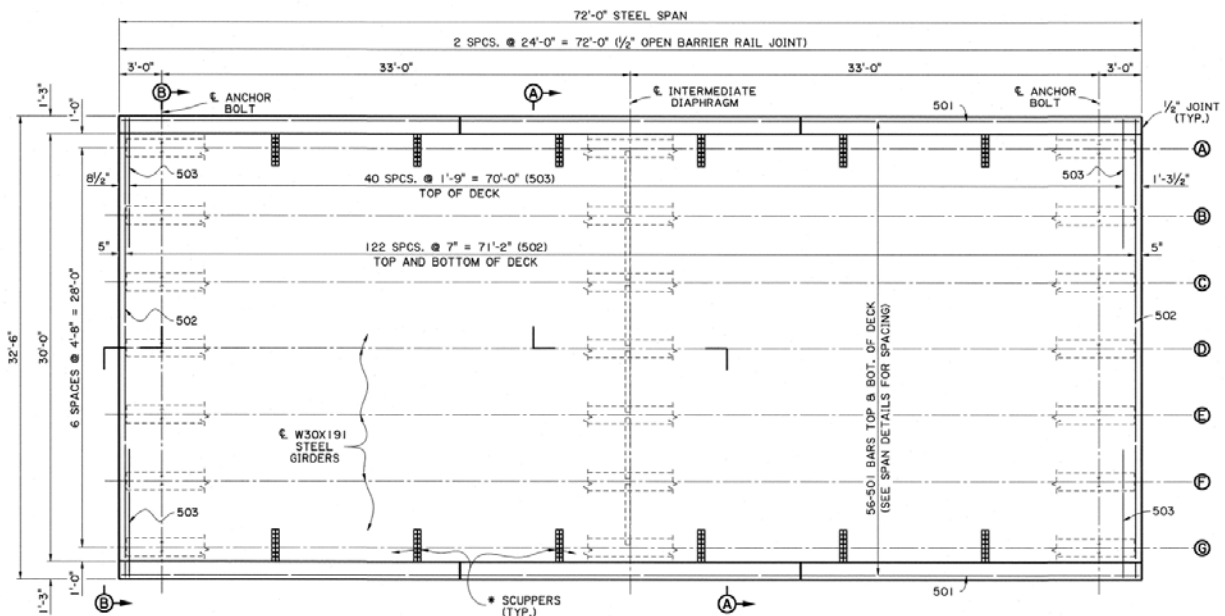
Diagram. Plan view of Maree Michel Bridge span.
